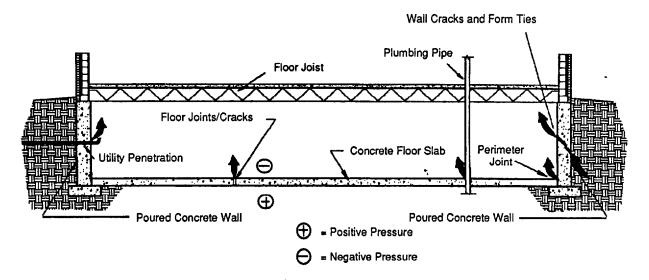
Typical radon entry routes in poured concrete basement walls.
